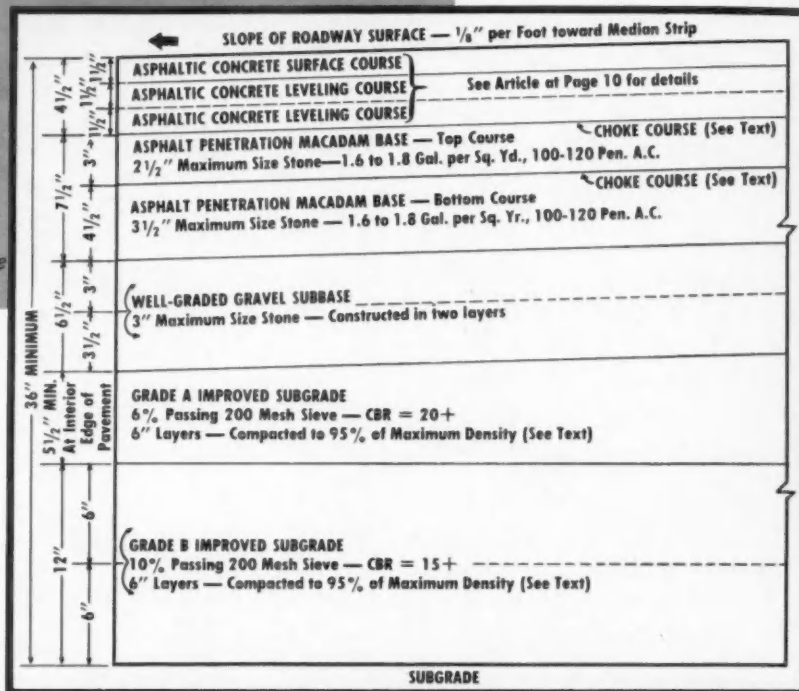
TYPICAL CROSS SECTION — NEW JERSEY TURNPIKE ROADWAY
